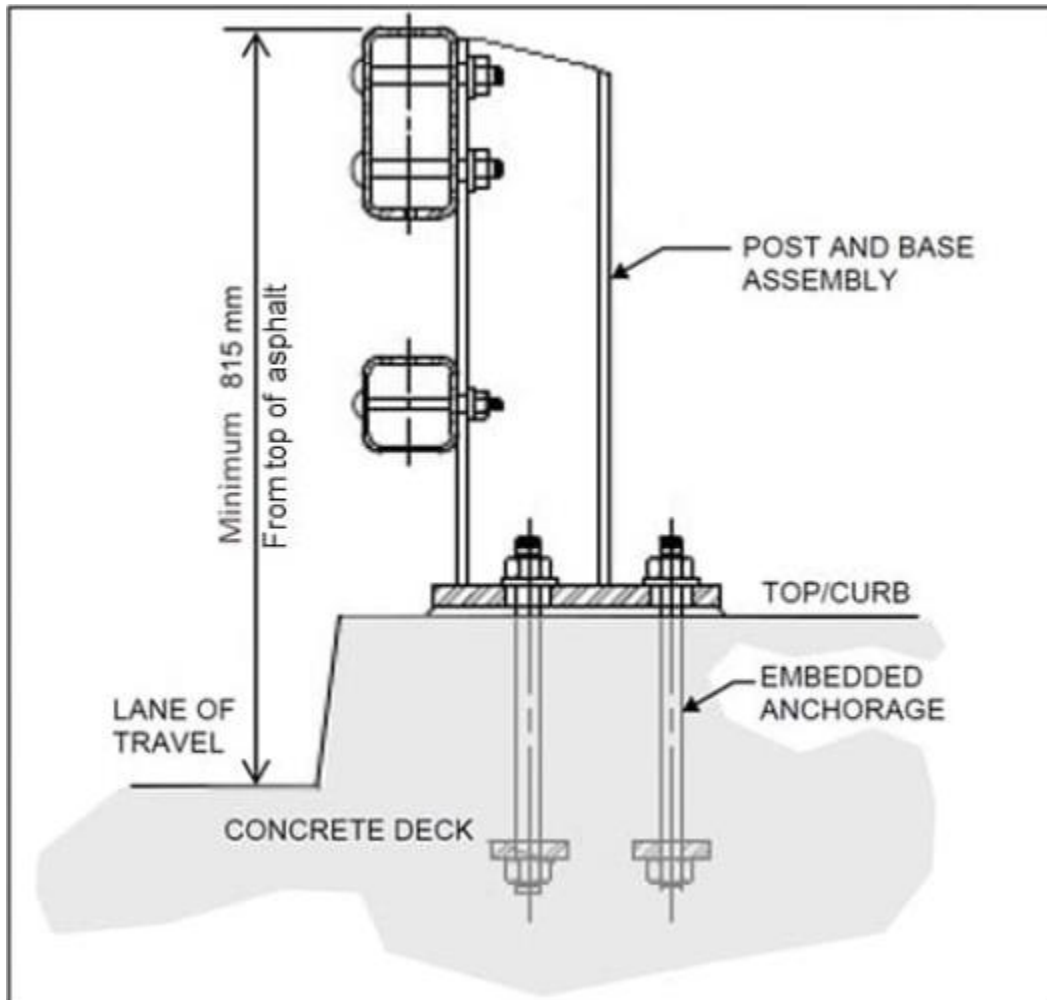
Proposed Rehabilitated Bridge Cross Section
